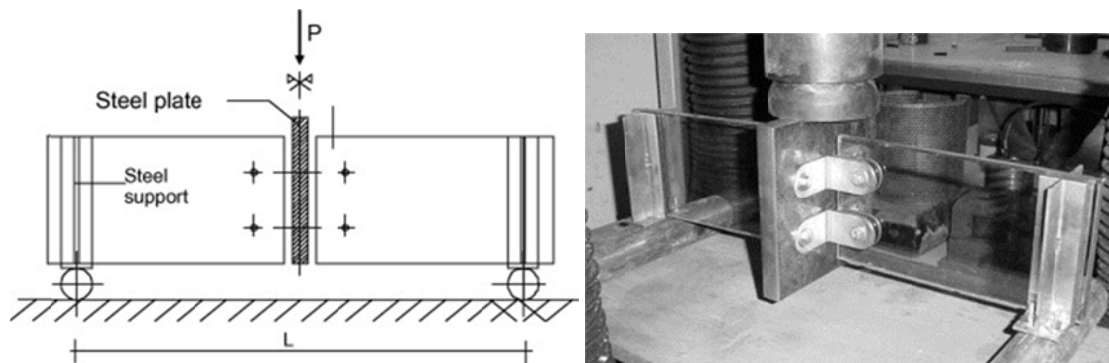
Test setup of the three-point bending test carried out by Campione et al. [13].
